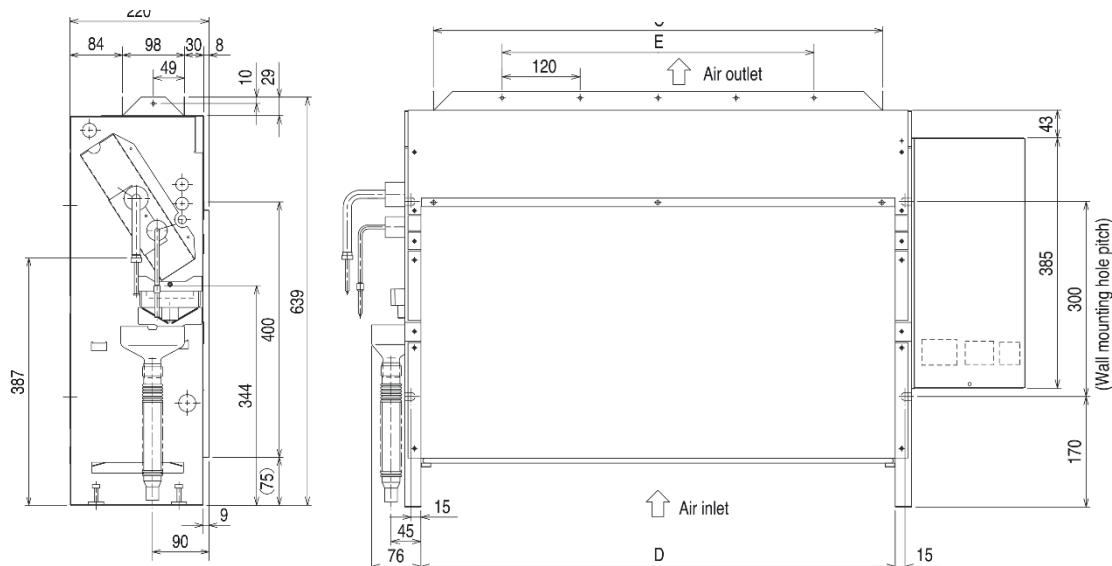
Typical Dimensions of fan coil unit to be used below sill and behind joinery
